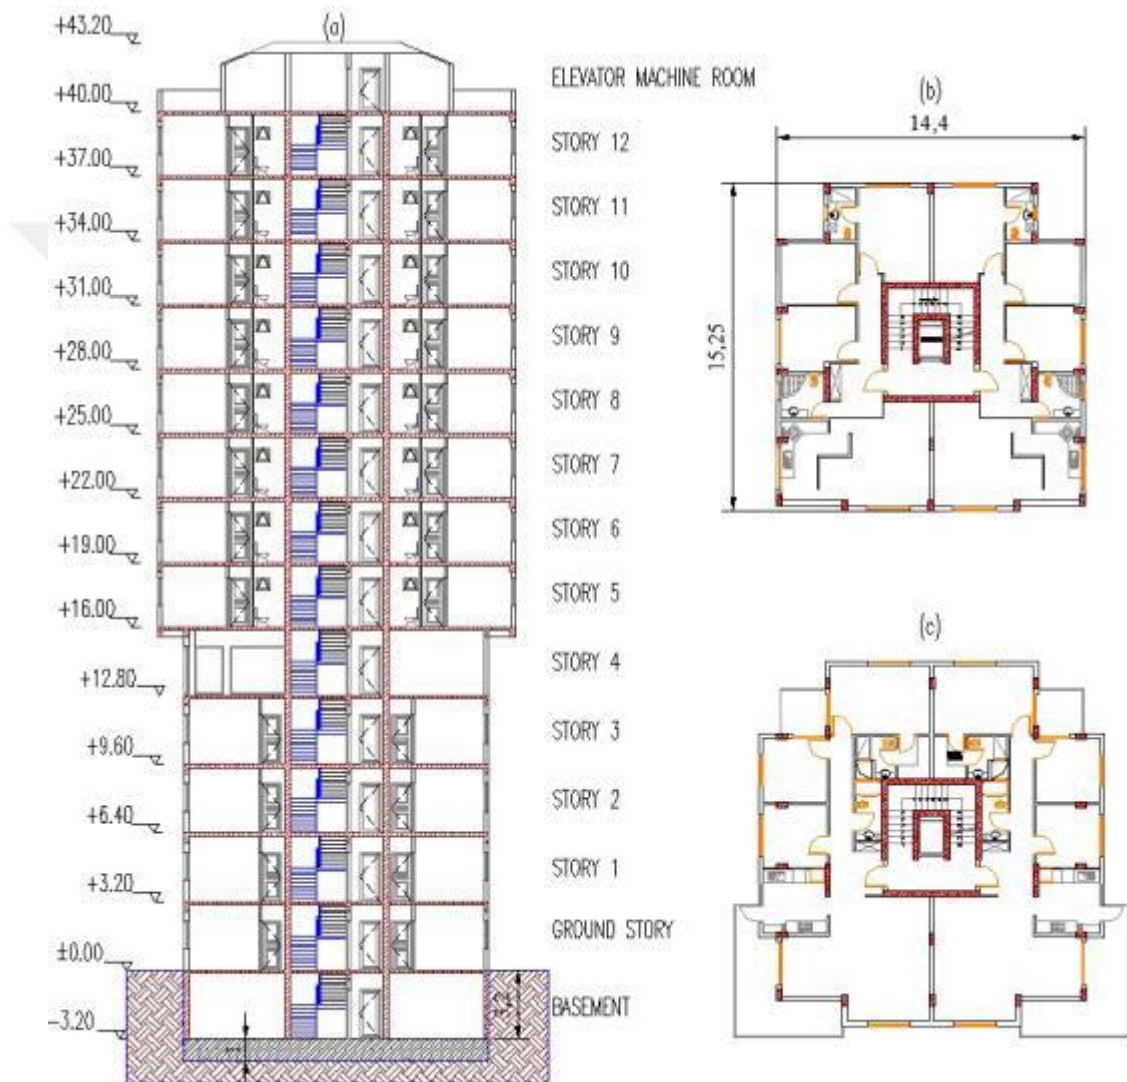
a) Structure section view, b) Architectural plan up to 4th story, c) Architectural plan up to 12th story
